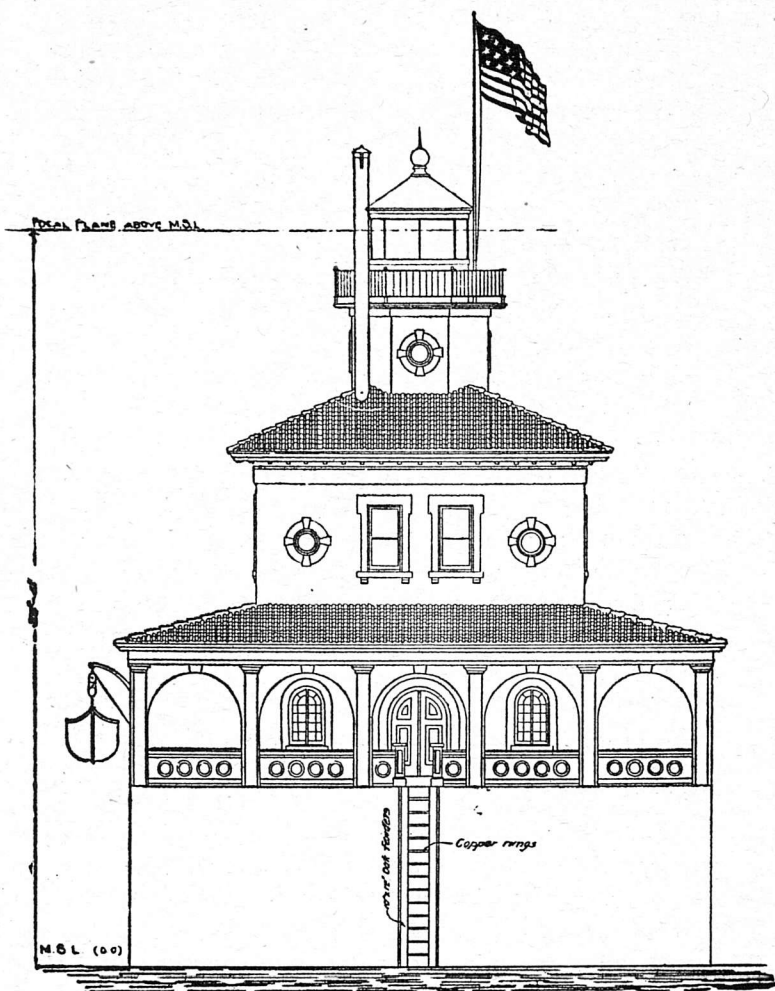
PLATE K—WEST BREAKWATER LIGHTHOUSE—56' 4" HIGH
